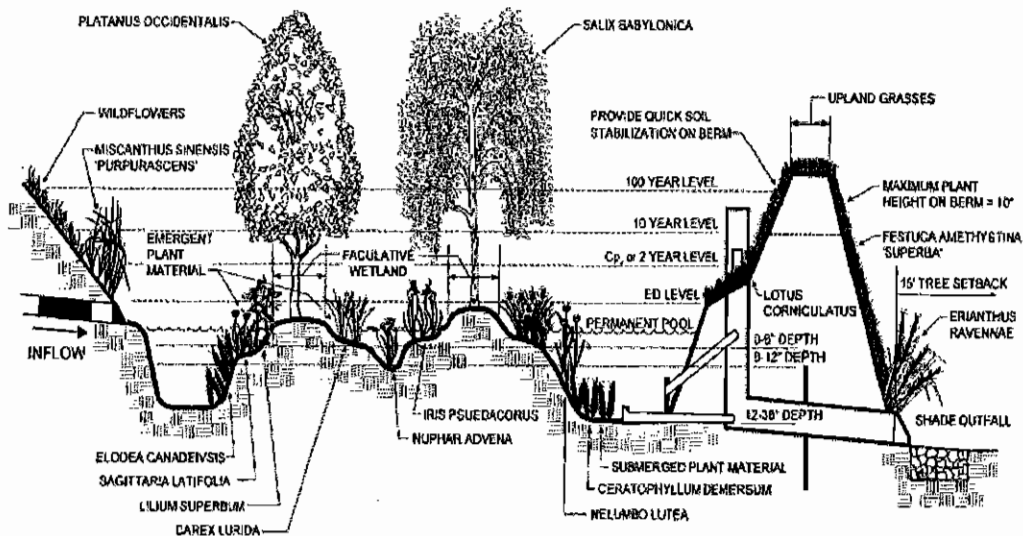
Section of Typical Shallow Extended Detention Wetland System
